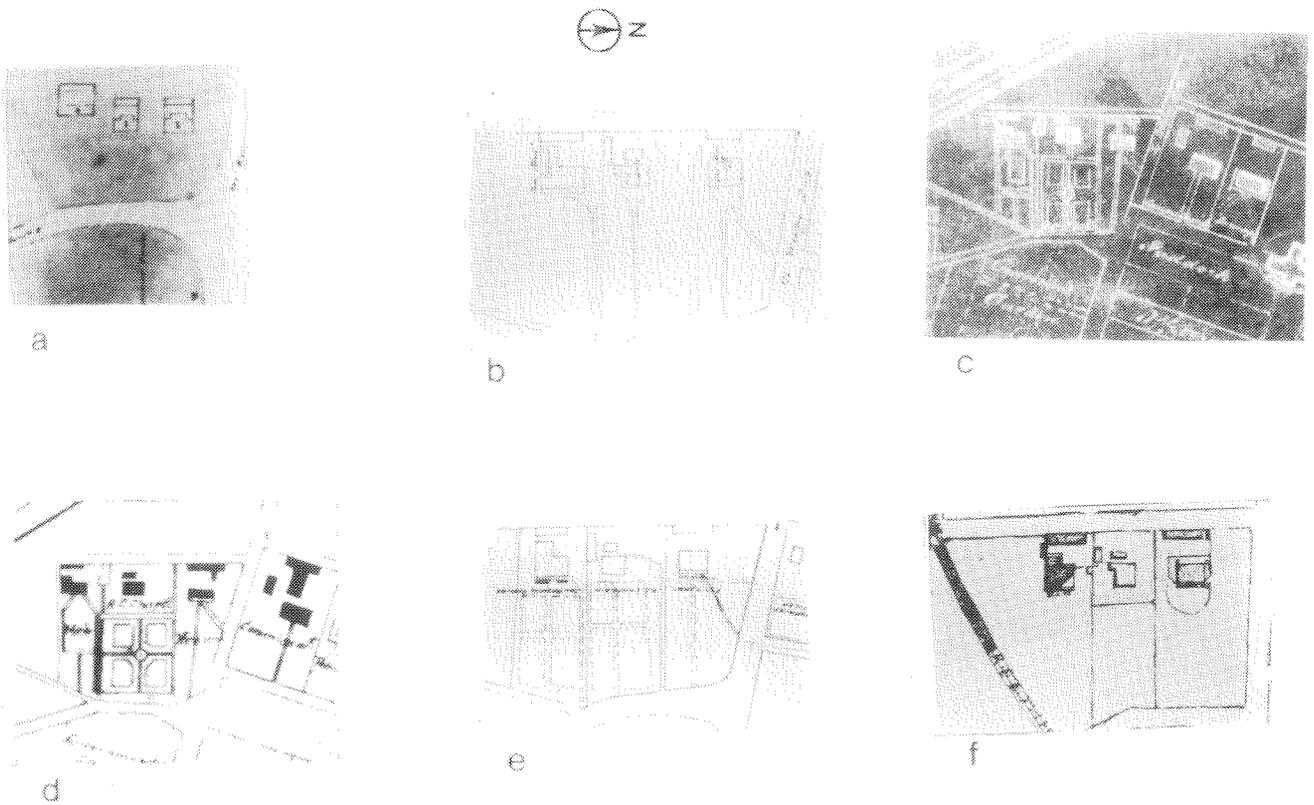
Portions of historical plans which relate to the penal officials' residences at Port Arthur: (a) 'Boyd' plan of 1854. (b) 'Lander' plan of 1858. (c) 'Pembroke' plan of 1858-62. (d) 'Imperial' plan of 1858-62. (e) 'Block' plan of 1862. (f) 'Blackwood' plan of 1877.
